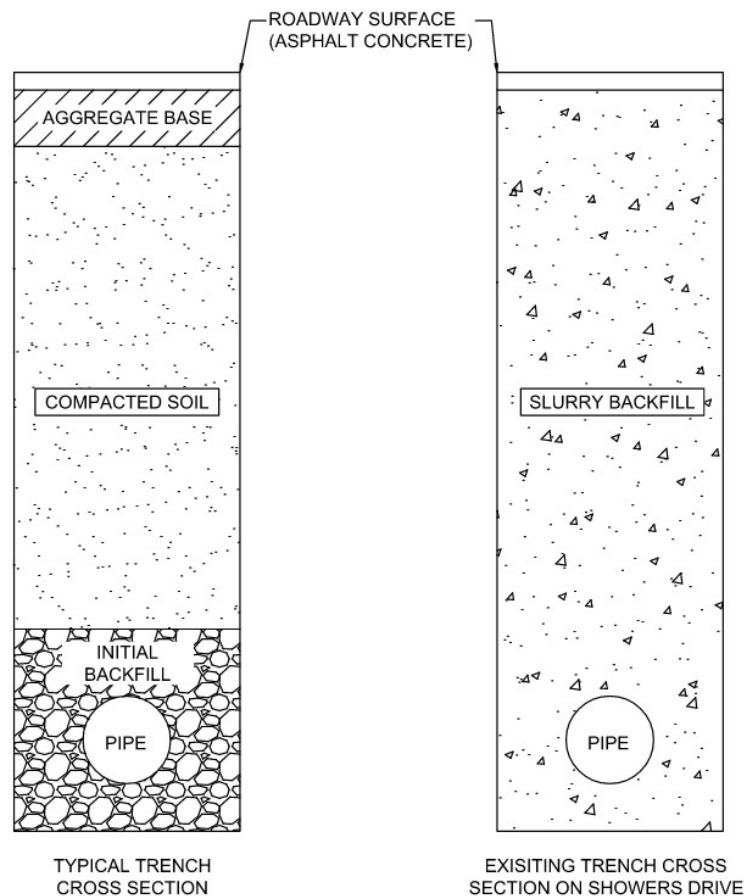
Typical Trench Cross Section vs Existing Trench Cross Section on Showers Drive
